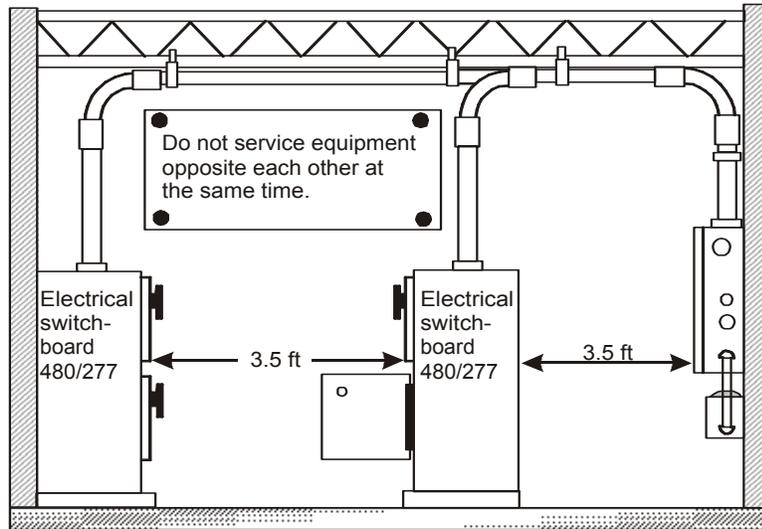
Access and working space requirements around enclosures and equipment.
